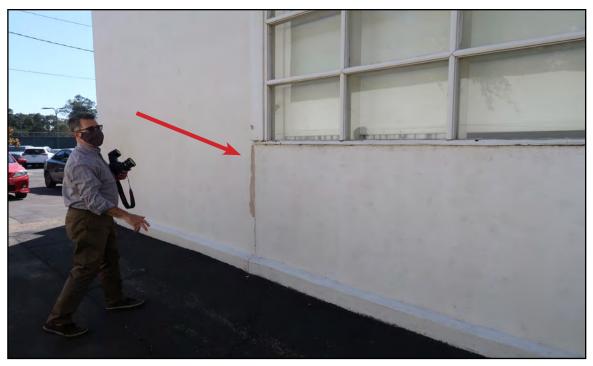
Detail of steel sash window on east elevation, note the tear in stucco where window originally extended to ground level and infilled at a unknown date, view southwest (Chattel, 2021)
